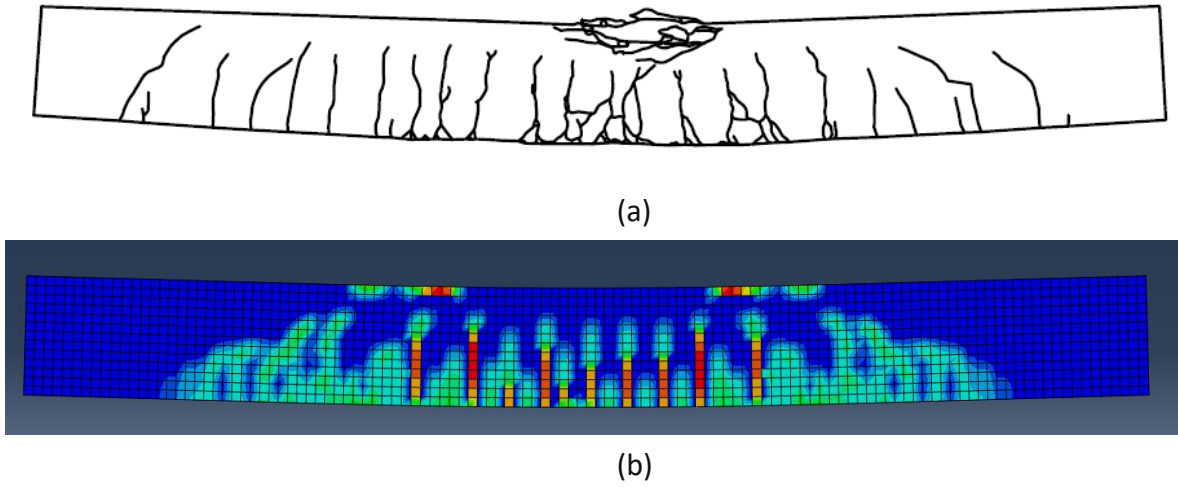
Crack patterns of strengthened beam 1RR-6L (a) Test (b) FE model
